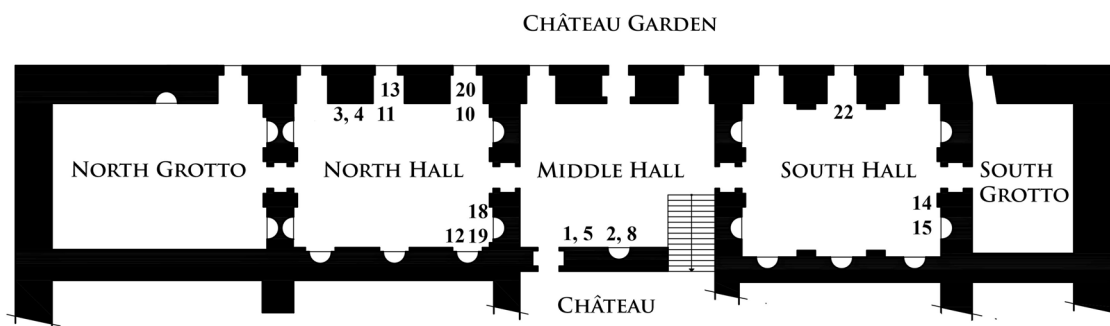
| Schematic Layout. Arrangement of the ground floor halls and the sample positions.
